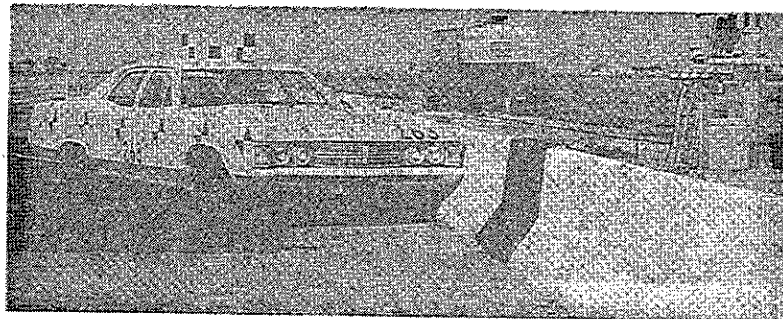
, IMPACT NEAR JOINT TO PROOF TEST THE JOINT DESIGN.
